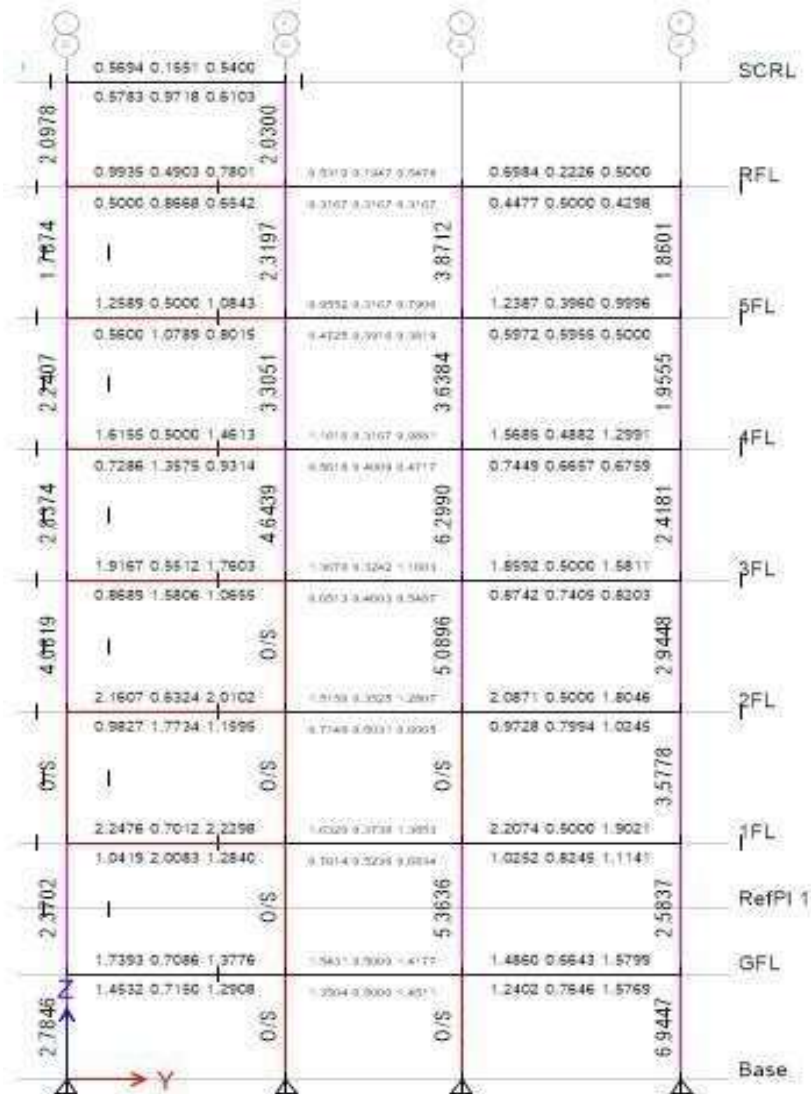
Elevation View zone-4 ZONE-4 f'c =3000psi and same frame section of zone-1 some frames are failed
